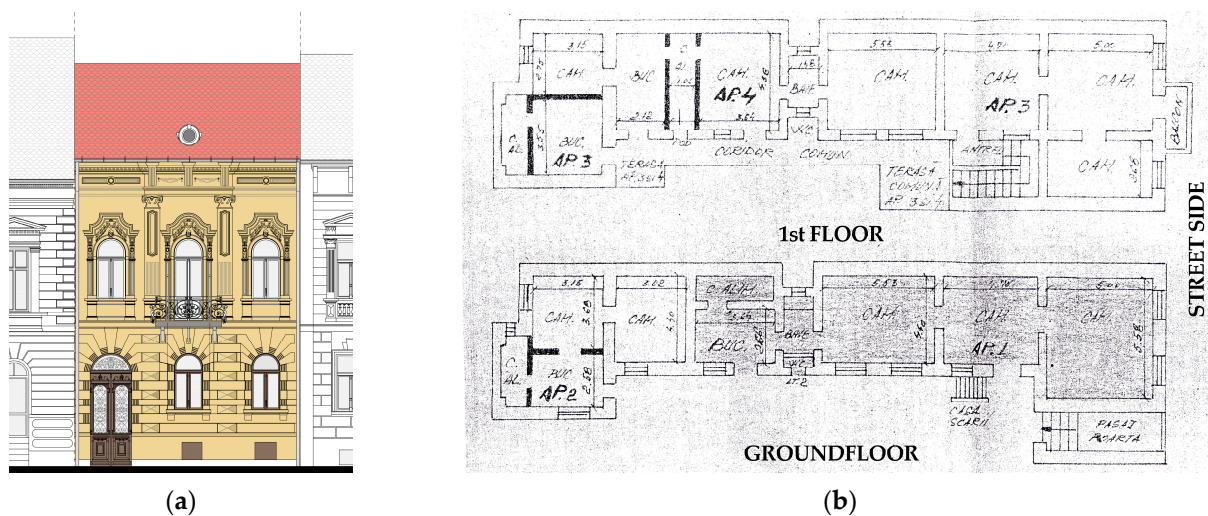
The analysed building: (a) street façade aesthetics; (b) layout of the building apartments (original building plans).
